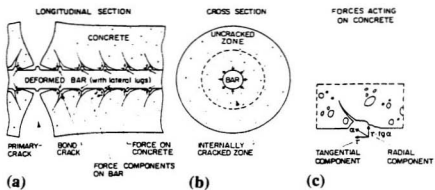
Internal bond cracks and forces acting on concrete [Goto (1971)]
